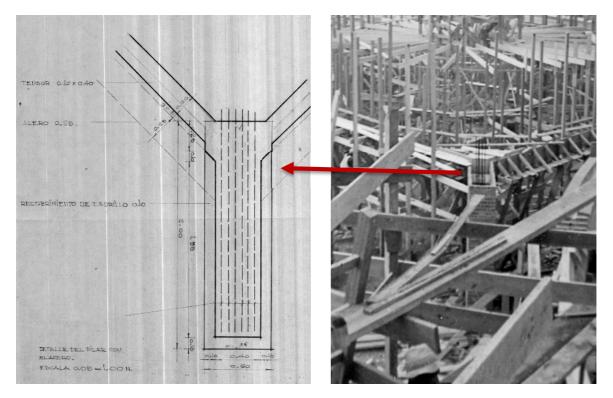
On the left, the original design of the concrete block located at the top of the pillars. In the middle, a picture from the construction site showing some iron bars jutting from the pillar (images taken from the ISA archive).
